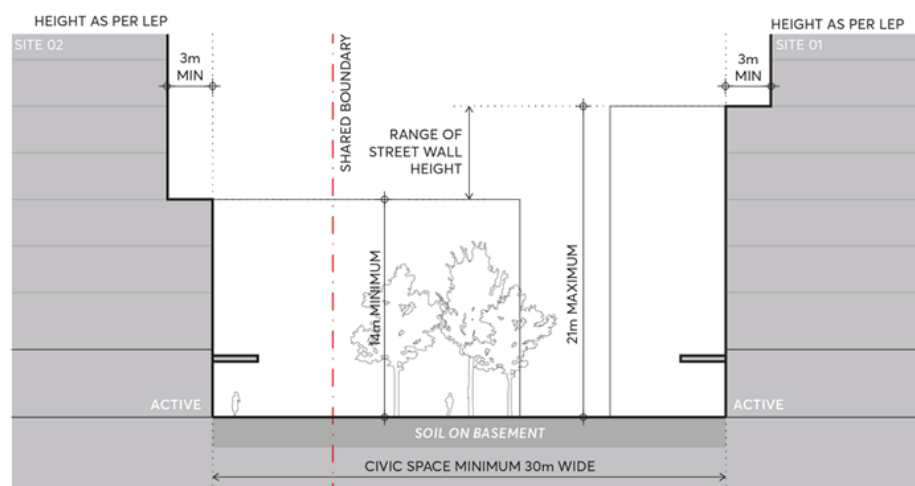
Civic Space (Section KJ) Setbacks and Street Wall Height
